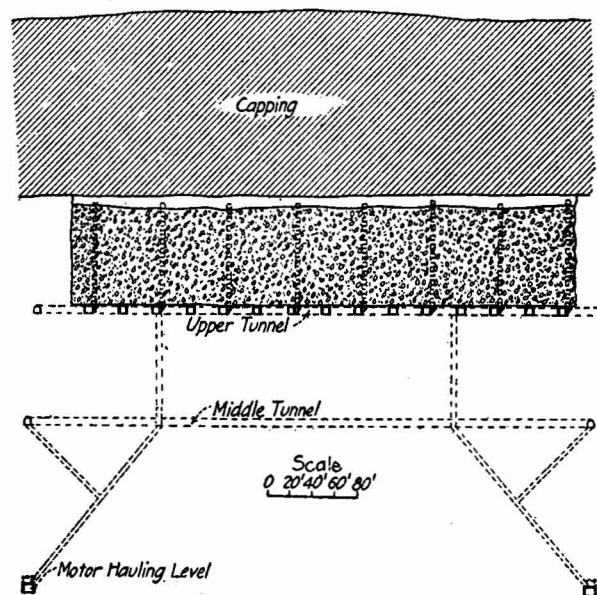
SECTION SHOWING HOW A STOPE IS STARTED ABOVE THE UPPER LEVEL AND THE RAISES THROUGH WHICH THE ORE IS DROPPED TO THE HAULAGE-LEVEL.
